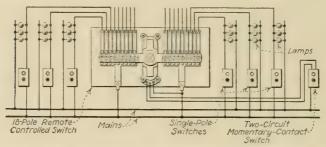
Wiring diagram of a multi-pole remote-controlled master switch. (Since each branch circuit has connected to it only one lamp-group, a single-pole switch may be used for single-location control of each lamp-group.)
